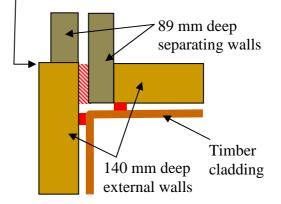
Plan view of staggered wall with a stepped internal wall due to the separating and external walls being different depths
